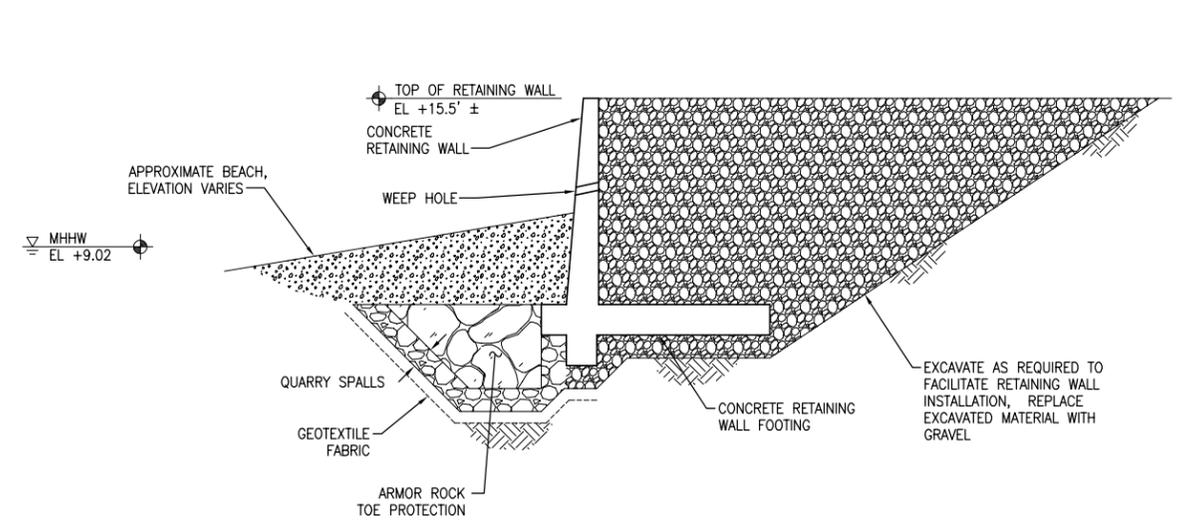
provided below contains detailed drawings of the design elements, and Table 1 provided below contains an alternative evaluation.
